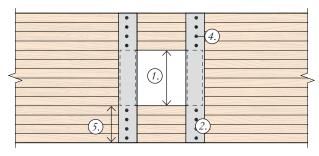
Small Opening with Fully Threaded Screw Reinforcing
